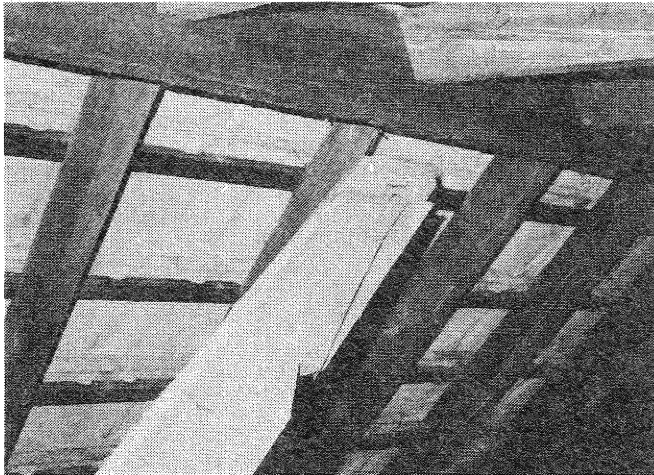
A failed connection of a diagonal timber roof brace to the ridge board of a concrete tiled roof
